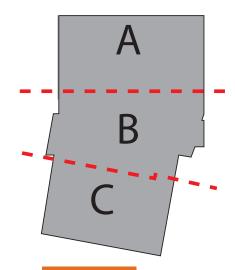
Two-PACT CBOC Prototype Flare Layout Plan Overview
